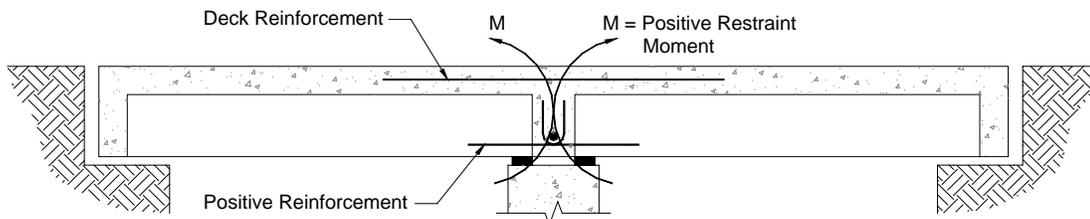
A typical precast prestressed bridge simply supported for dead load and made continuous for live load.
